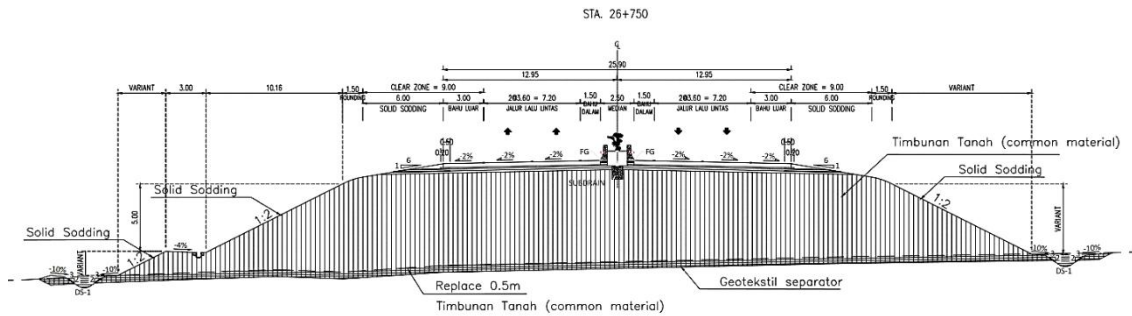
Drawing engineering detail (DED) of section STA 26+750
